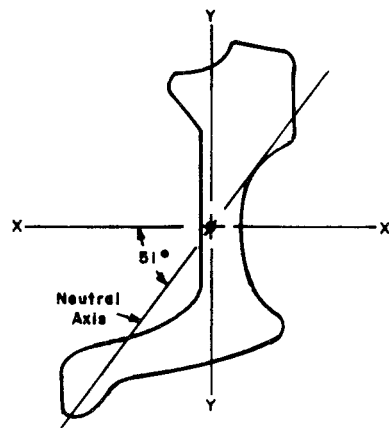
EXAMPLE OF UNSYMMETRICAL TYPE OF JOINT BAR ⁽²¹⁾
